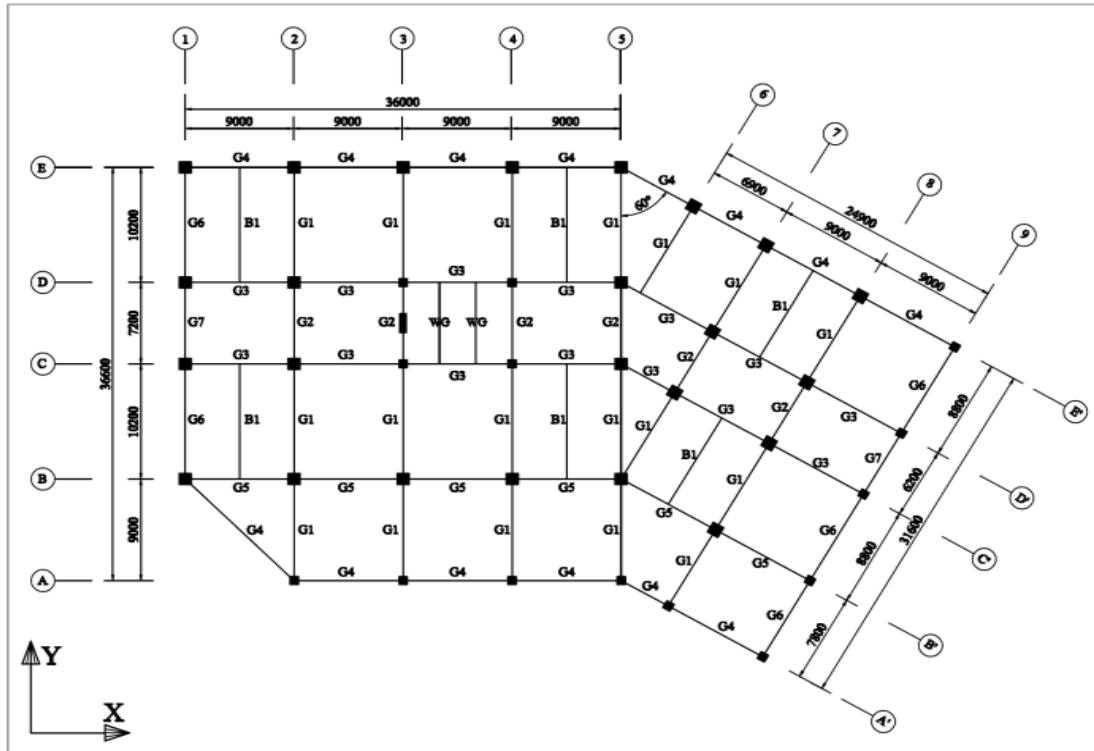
Plan layout of the girders and beams for the first 3 storeys of irregular 20-storey, multi-bay RC building (all dimensions are in millimetres).
